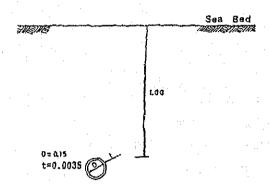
Typical Cross Section of Pipline Setting Out
